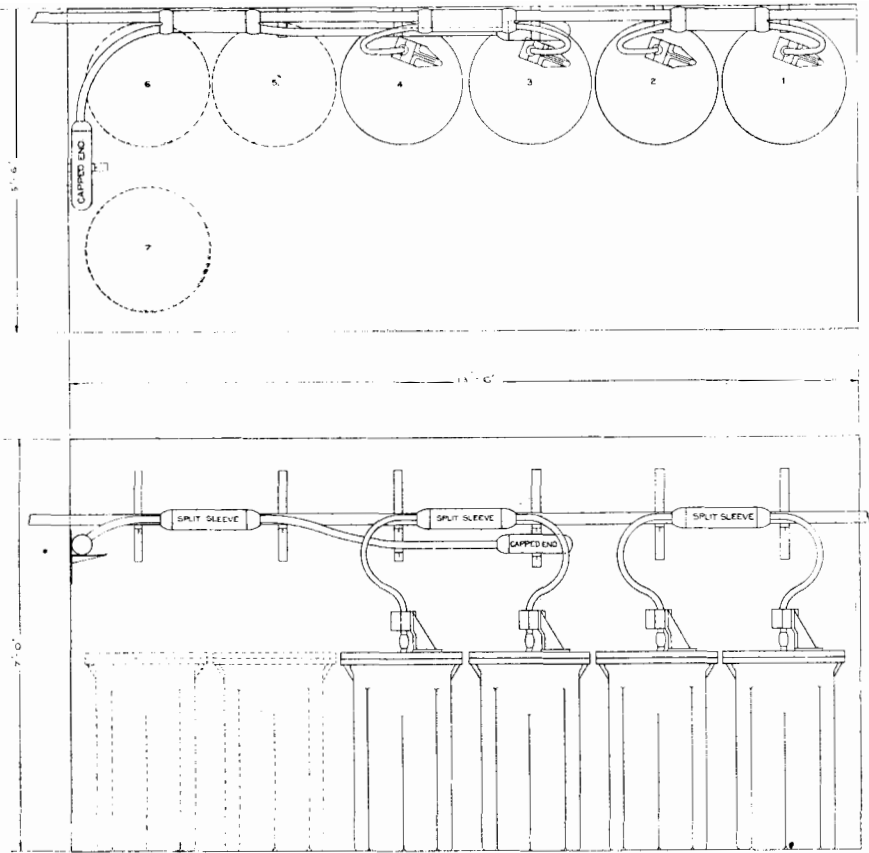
LAYOUT OF MANHOLE WITH SINGLE STUB CASES.
